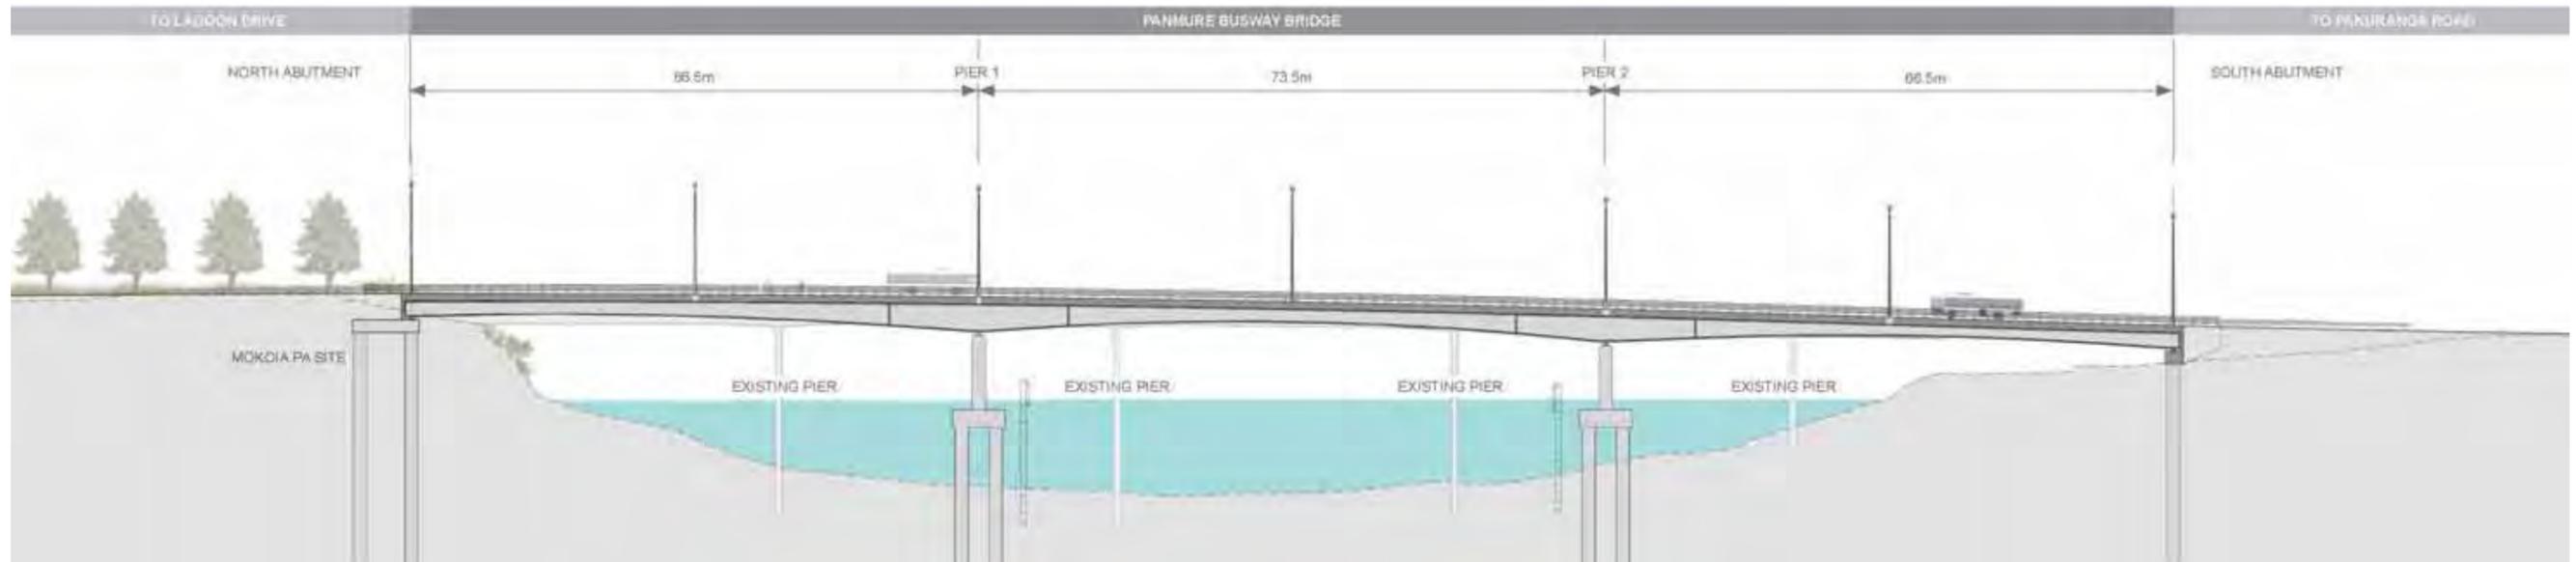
Long elevation looking north-east to show pier positions in the river. The existing bridge is in front of the new bridge and will screen it from view.
